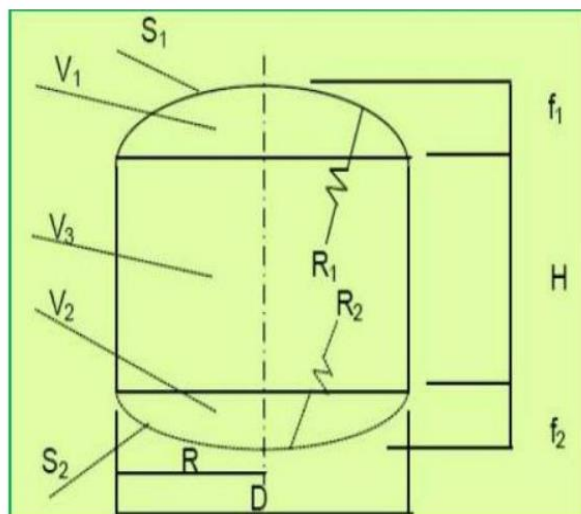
Geometrical dimension of the designed cylindrical fixed dome digester
